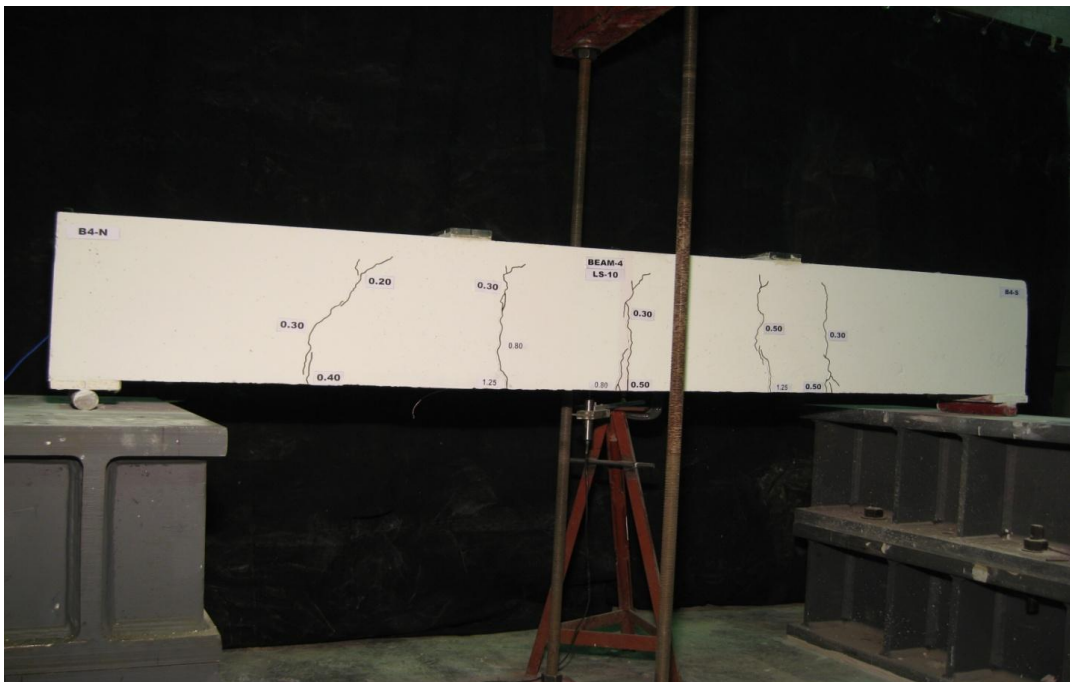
Cracking pattern for beam 4 at a load of 70.24 kN (B4-LS10)
